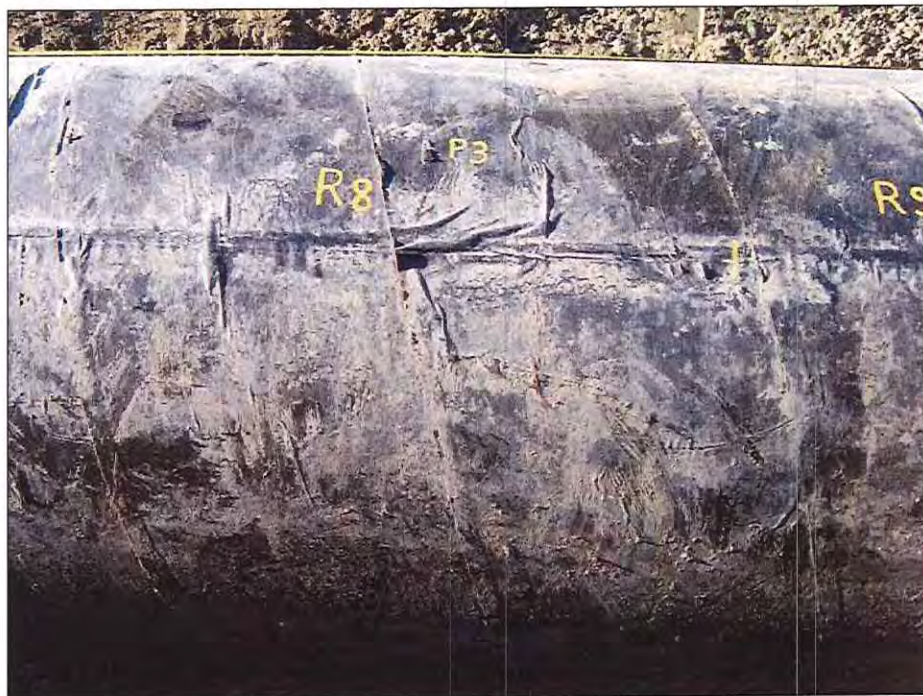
• Site 2. Disbonded Coating at Longitudinal Weld. Looking North – 02.
